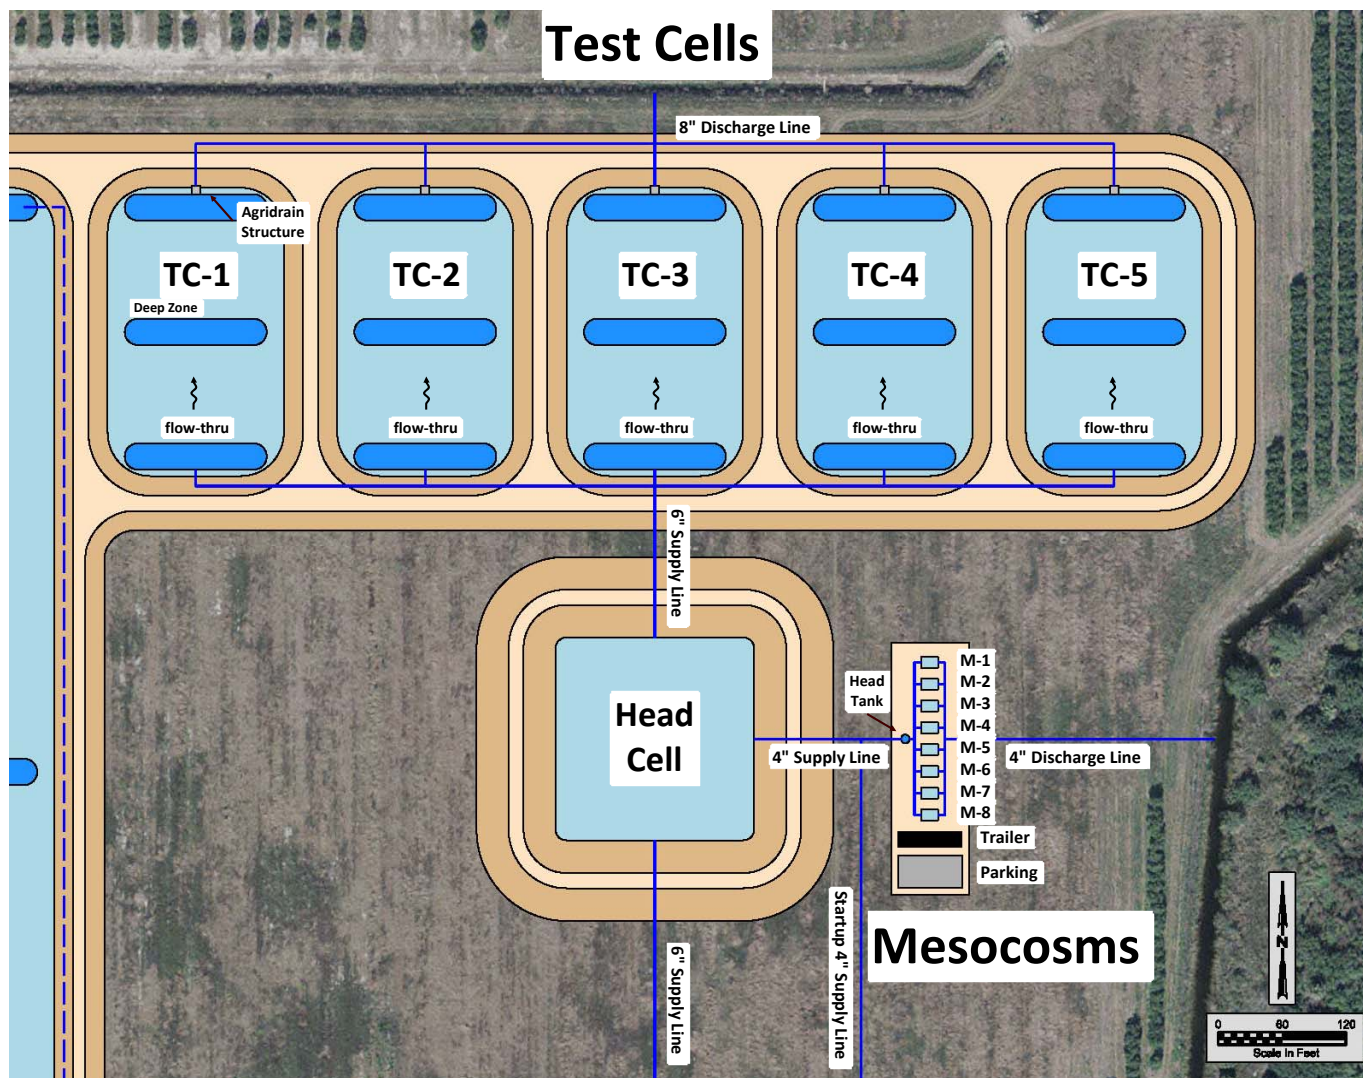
Proposed C-43 WQTA Test Facility Site plan – Test Cells and Mesocosms
